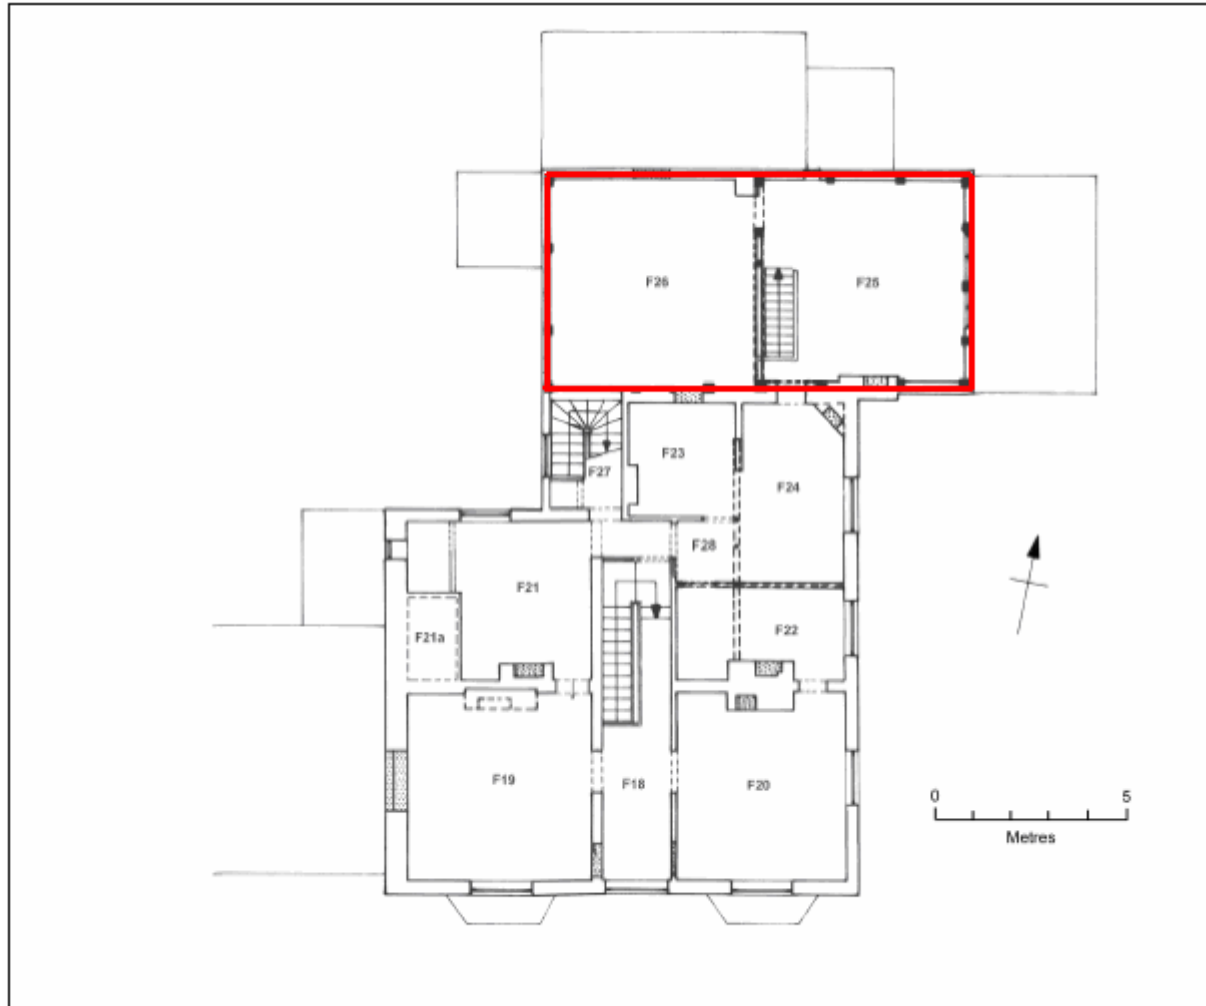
First-floor plan, northern range outlined in red (University of Manchester Archaeological Unit)
